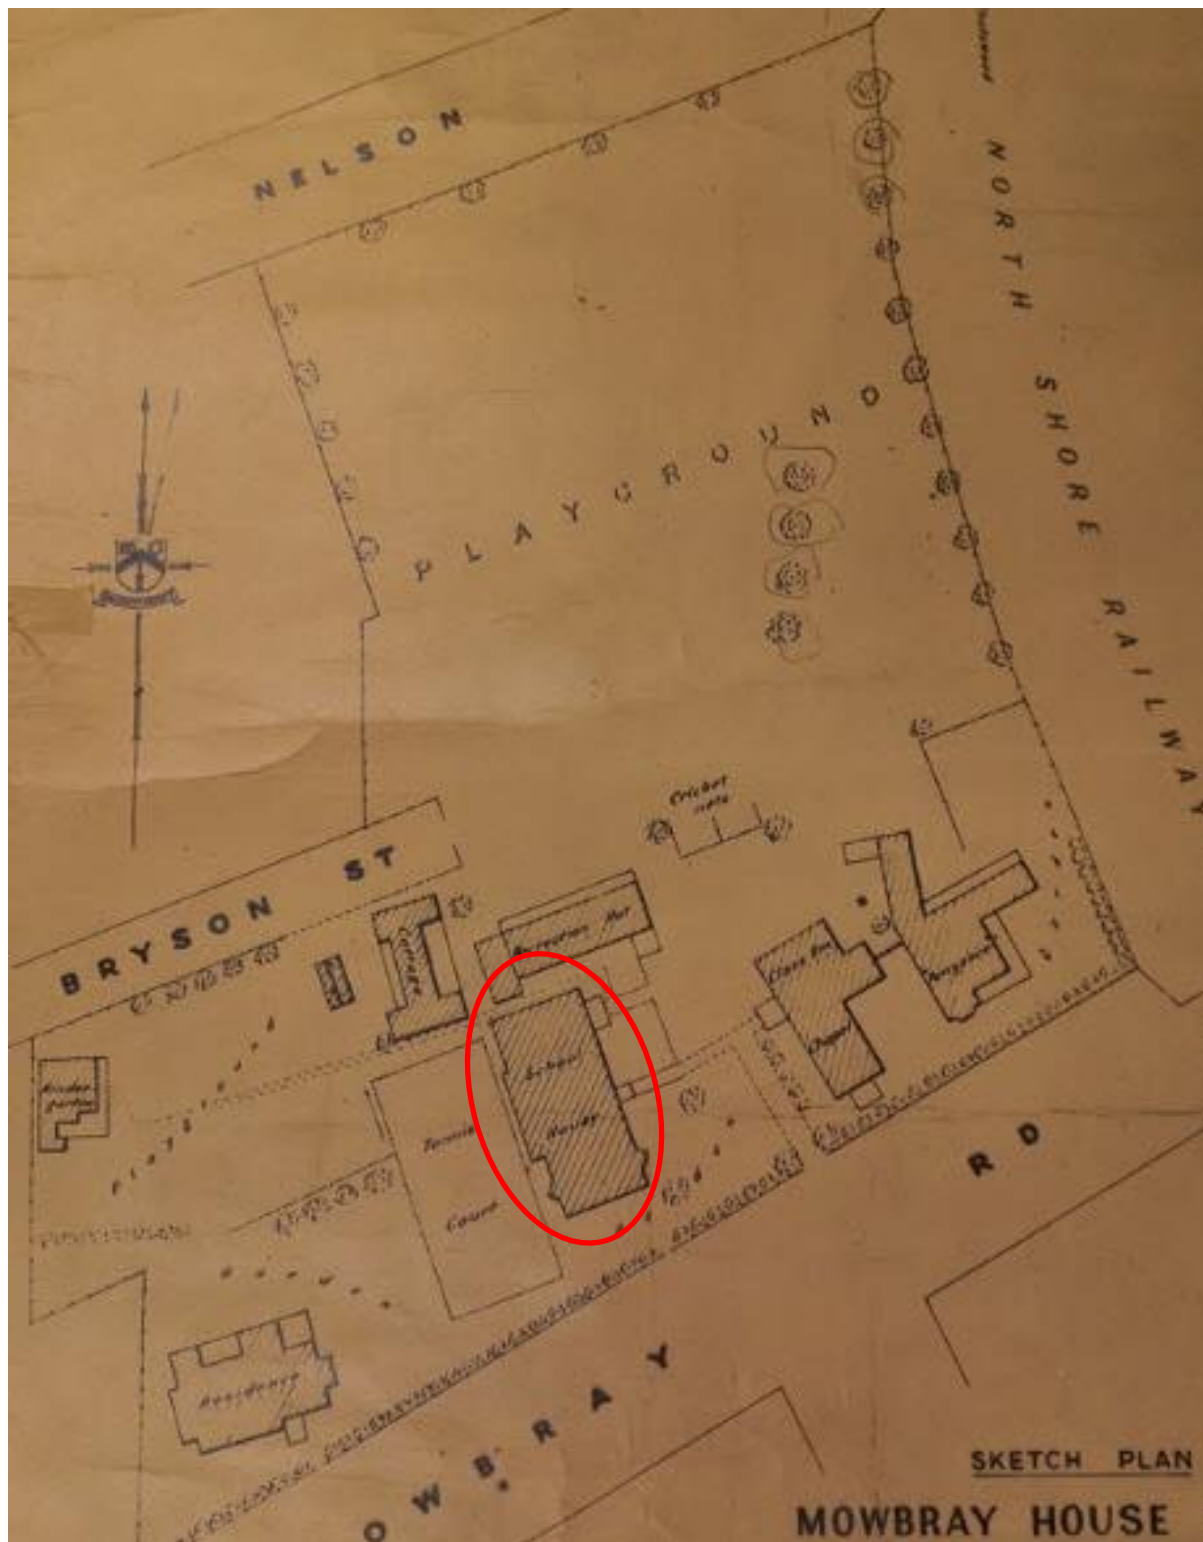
Sketch Plan of Mowbray House School, highlighting present day Mowbray House.
